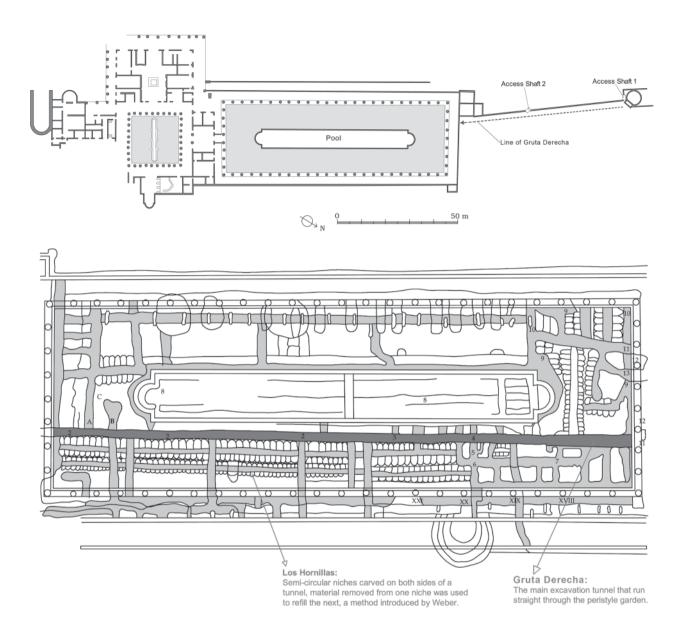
Schematic plan of the Villa of Papyri and the first access shafts, the axis also illustrates the direction of the main excavation tunnel, *gruta derecha* (adapted from Parslow, 1995, 78).
